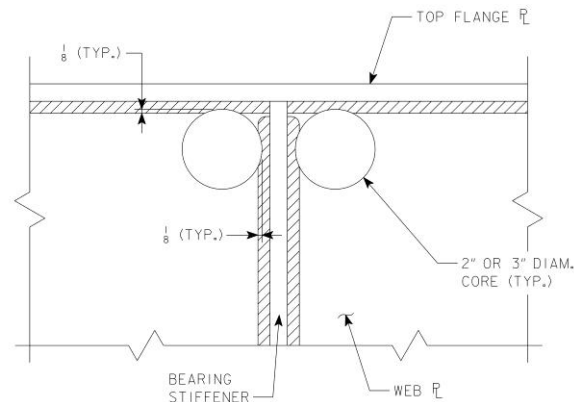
Bearing Stiffener Fatigue Crack Retrofit
